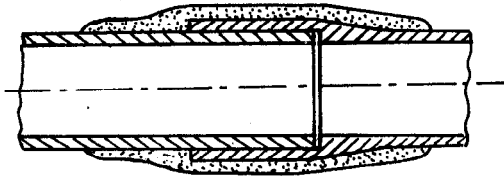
ILLUSTRATION OF SPIGOT AND SOCKET JOINT WITH GLUE AND OVERLAY
